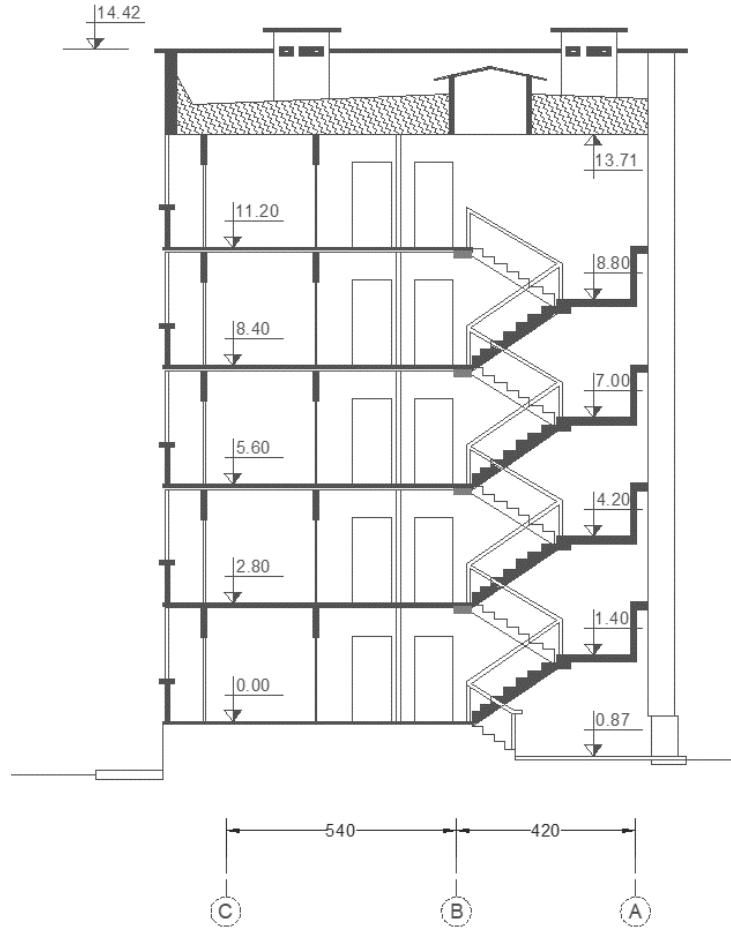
The elevation view of the A Template (82/1) and B Template (82/2) buildings
